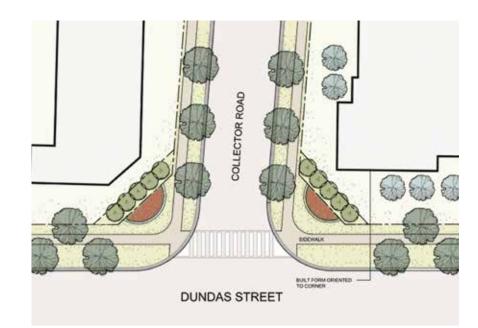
Preliminary Concept of gateway streetscape at the corner of Dundas Street and the north-south 22m R.O.W. avenue/transit corridor
